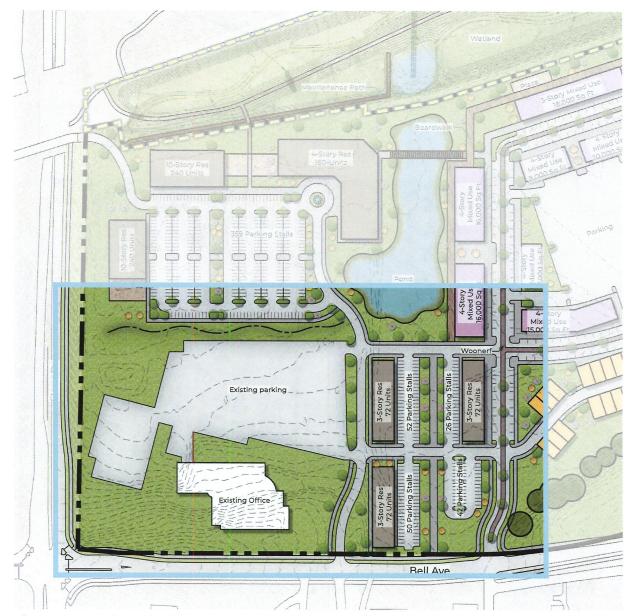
Final South of Gray's Lake Master Plan - Southwestern Section
